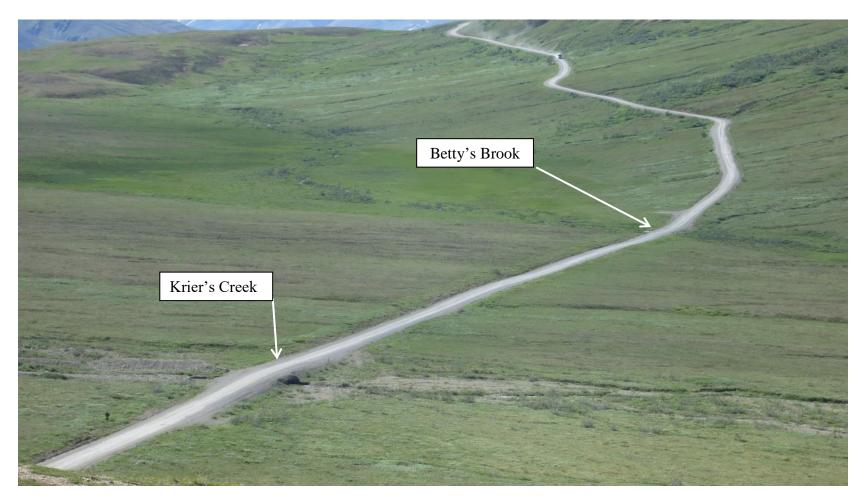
Current overview of MP 62.7 (Krier's Creek) and MP63 (Betty's Brook) from Stony Hill Overlook, looking west (NPS Photo, July 17th, 2018). Note 47 ft. width of road at Krier's Creek.
